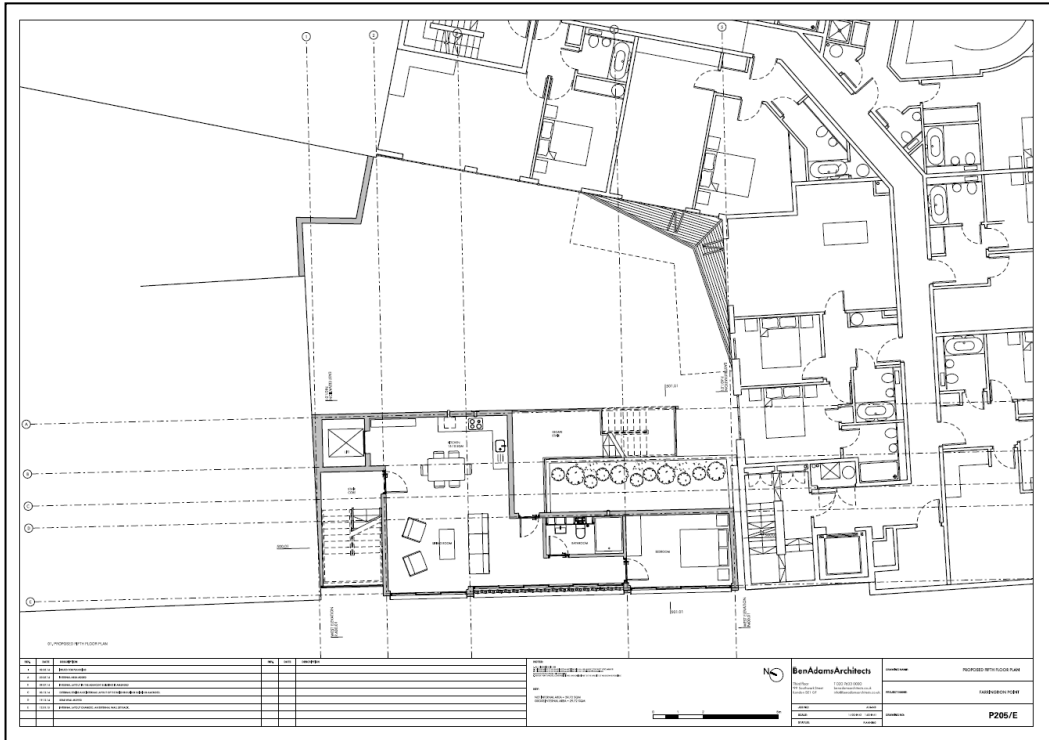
Proposed Fifth Floor (©Ben Adams Architects)
